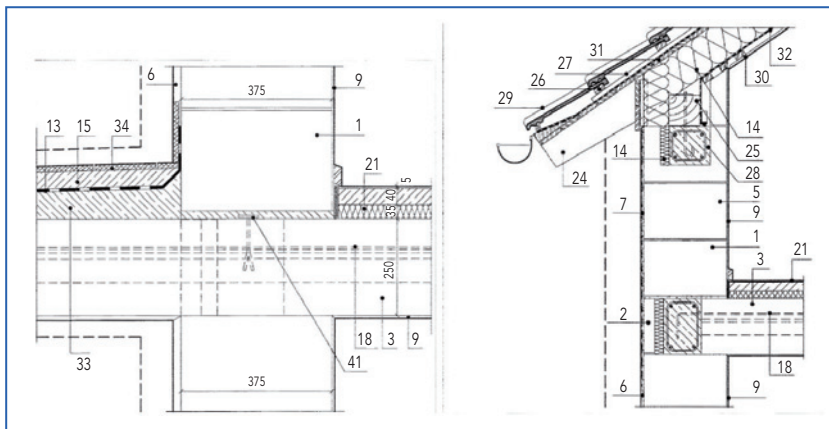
Details of brick system from aerated concrete - floor junction with balcony (left), cap (right) [10].
